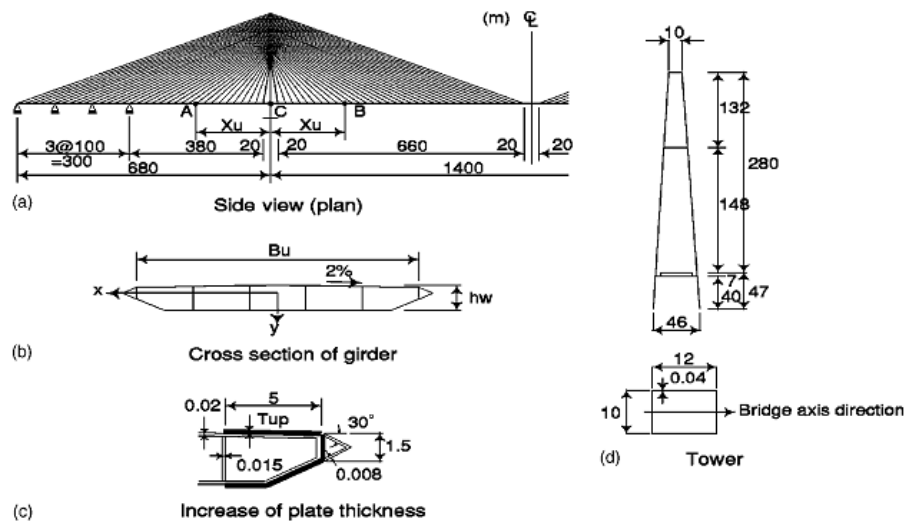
1400 m cable-stayed bridge scheme (Unit: m)
